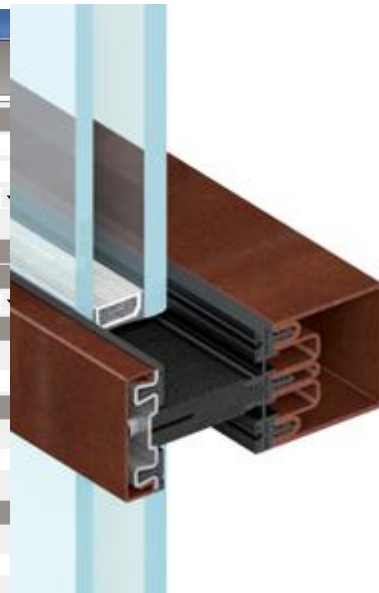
PARTICULAR OF CORTEN STEEL FRAME
